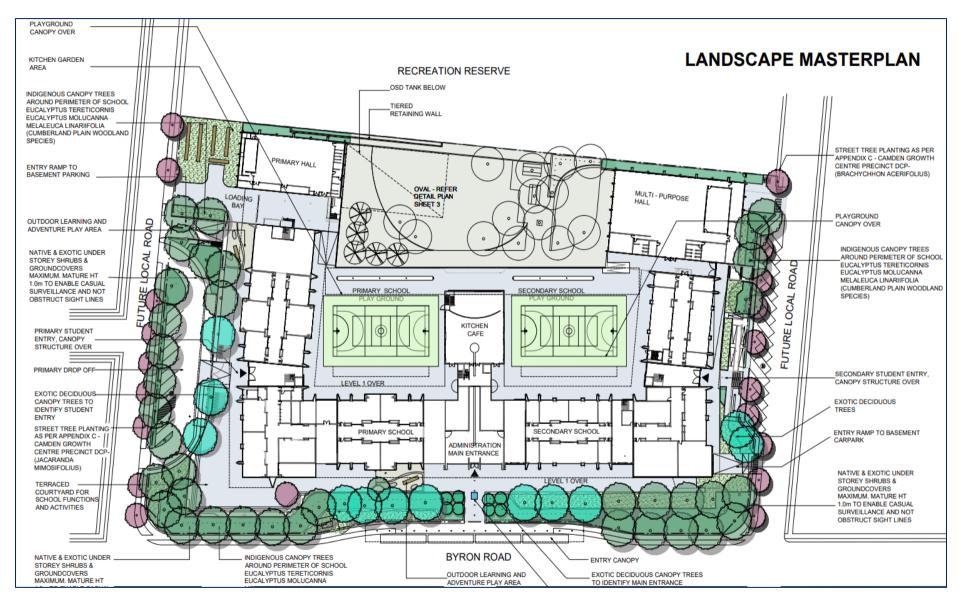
| Landscaping masterplan, as proposed to be modified (Source: Applicant's Modification Report
